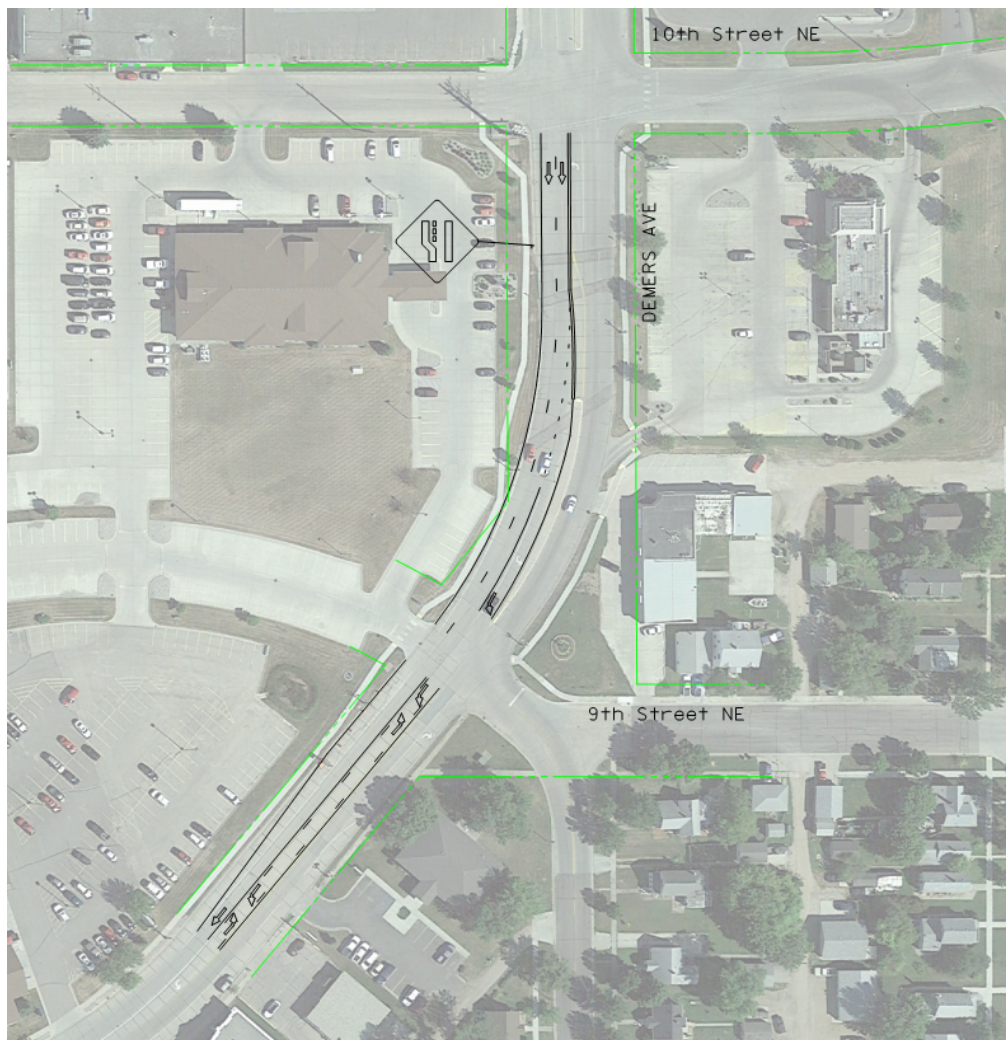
5. Lane Drop and Left Turn Lane Striping Improvement – 10th Street NE to 9th Street NE
